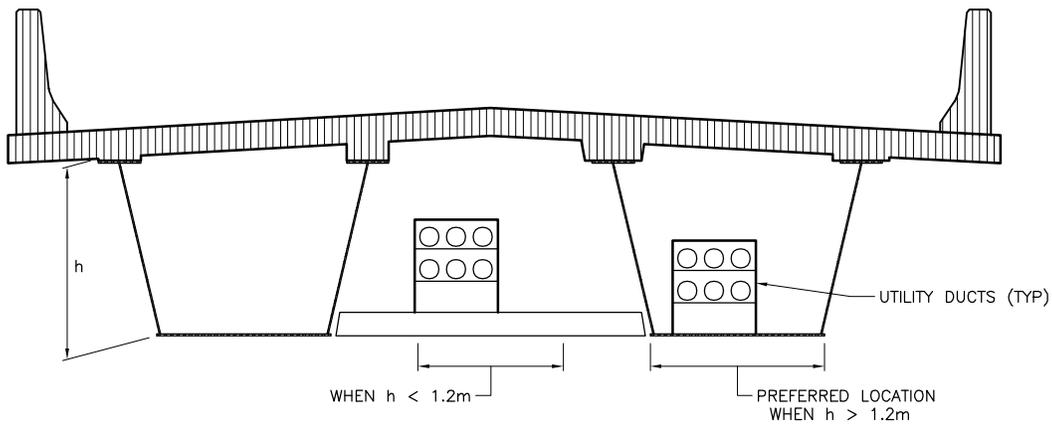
Slab on Concrete/Steel Box Girders
